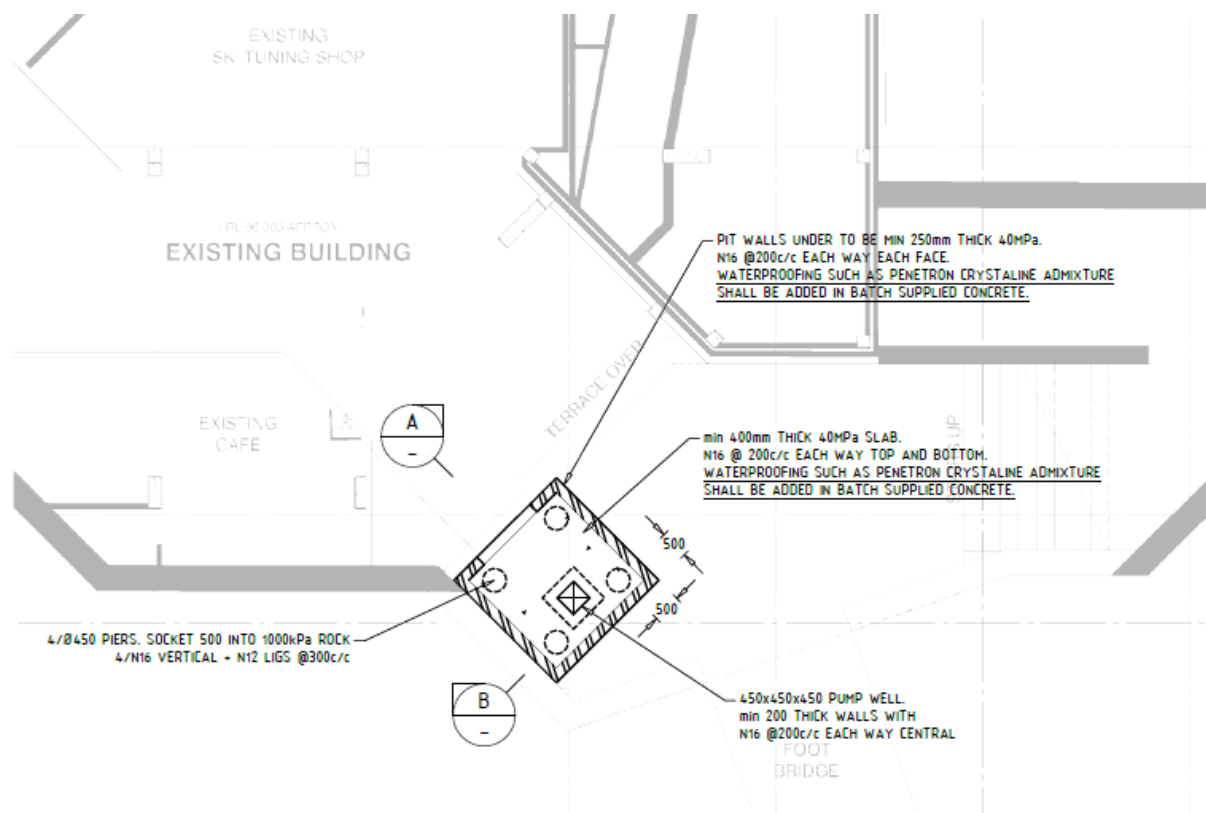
| Footing Plan for the proposed lift (Source: Applicant's documentation)
